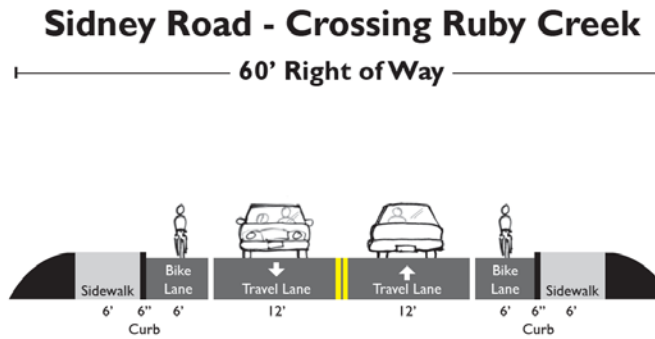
Sidney Road SW. Where Sidney Road SW crosses Ruby Creek, the road will narrow and taper to the above standard. This will minimize impacts to Ruby Creek while providing for nonmotorized connectivity. This section requires culvert replacement.
